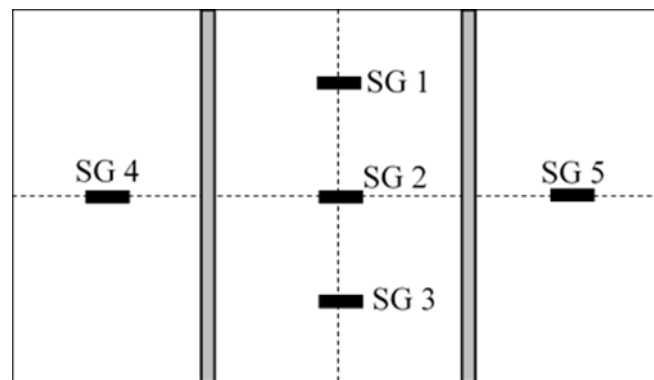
Instrumentation – location of strain gauges (all strain gauges are placed on bottom concrete wall)
